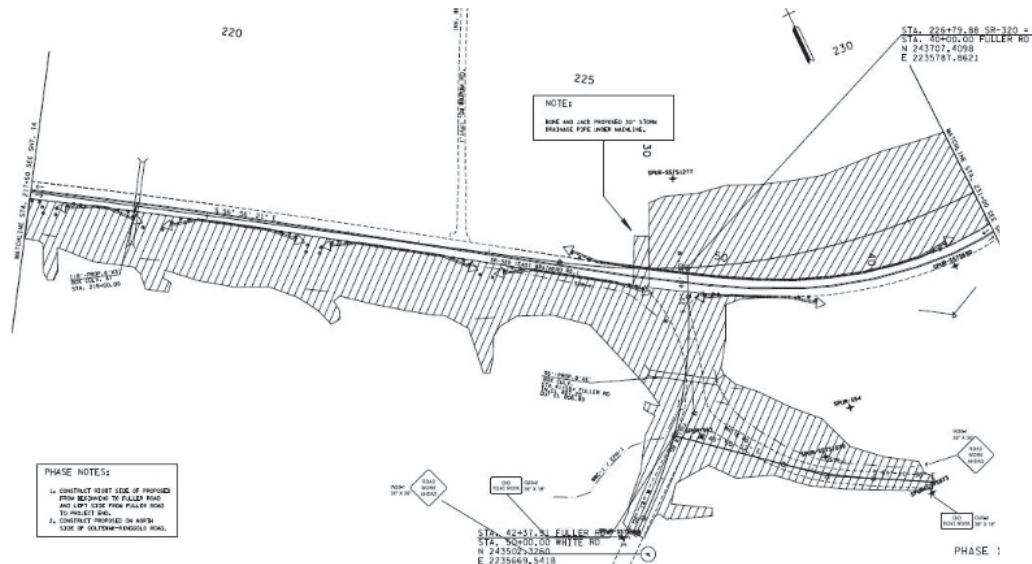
Traffic control diagram of SR-320 at Fuller Road during Phase 1 (05/12/2020 ROW Field Review Plans, Sheet T5)
